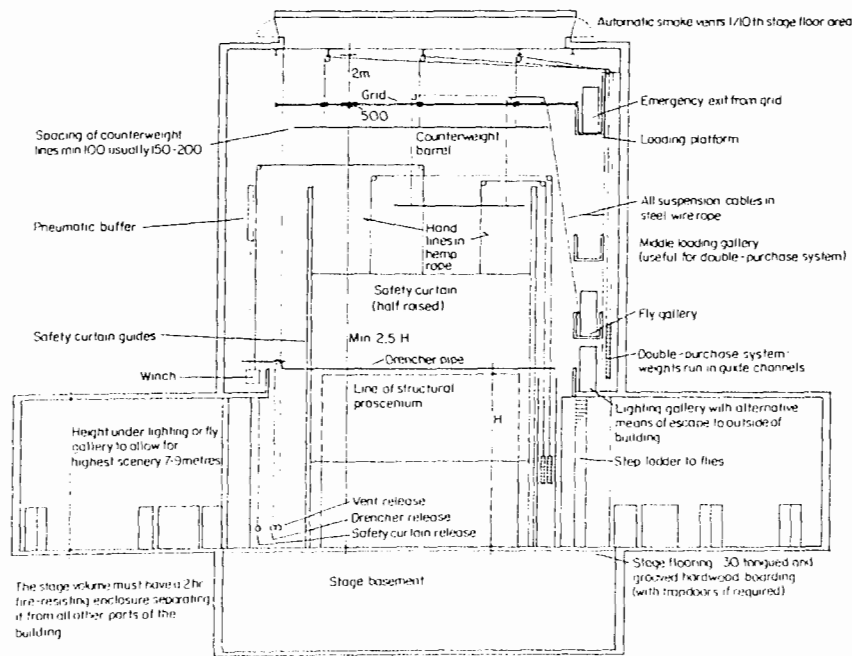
Typical section through stage and fly tower looking towards auditorium
